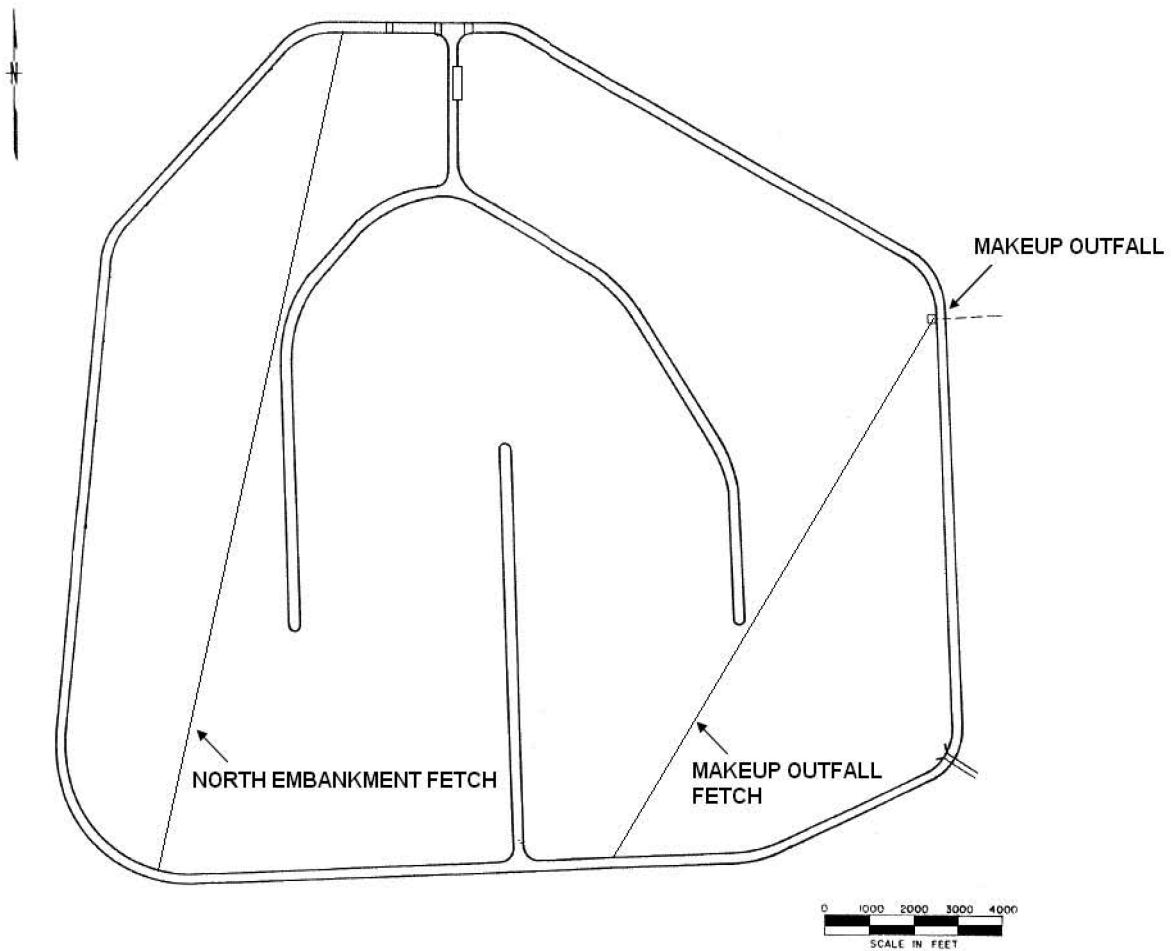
S.8-3 Determination of Fetch at the Makeup Outfall and at the North Embankment
